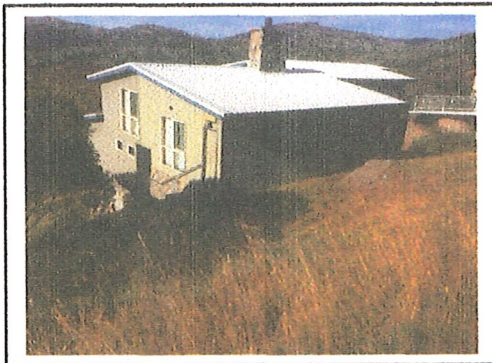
looking south. Slope down to lodge at site of proposed steps.
